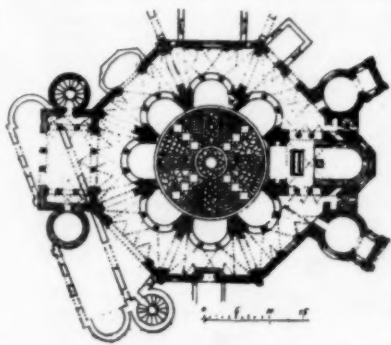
Plan of S. Vitale, at Ravenna (6th Century).
